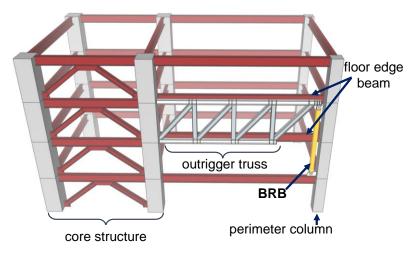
The 3D schematic view of the BRB-outrigger system
